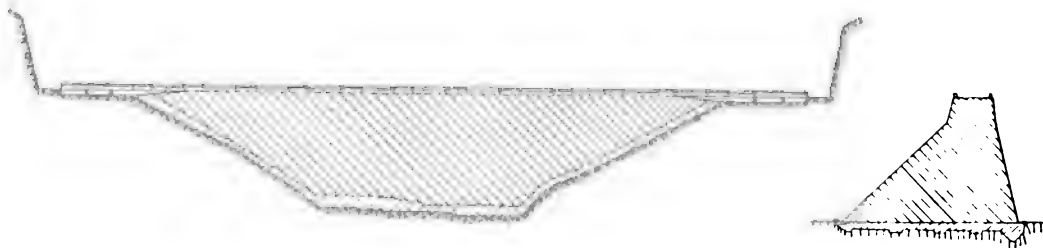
Longitudinal and Cross Sections of Gileppe Barrage.
